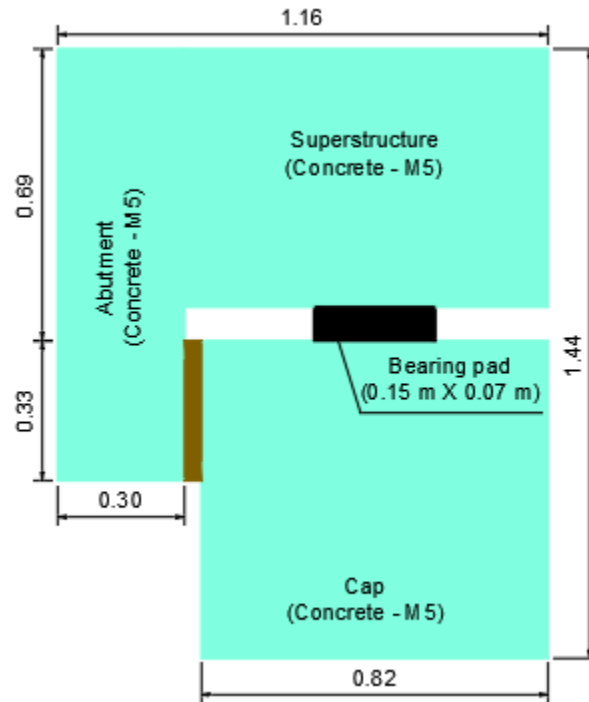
Detail of proposed alternative abutment-cap system (dimension in m)
